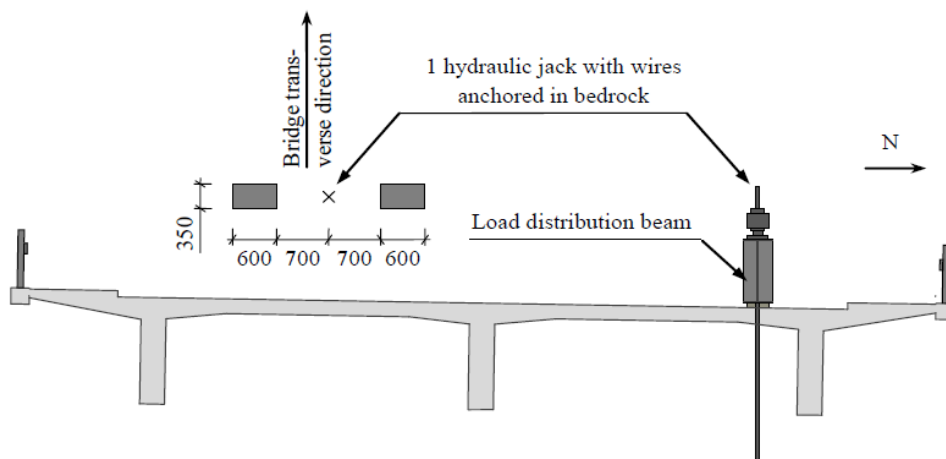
Bridge section showing the slab full-scale test arrangement. On the left is the loading plate plan. Adopted from (Bagge 2014)
